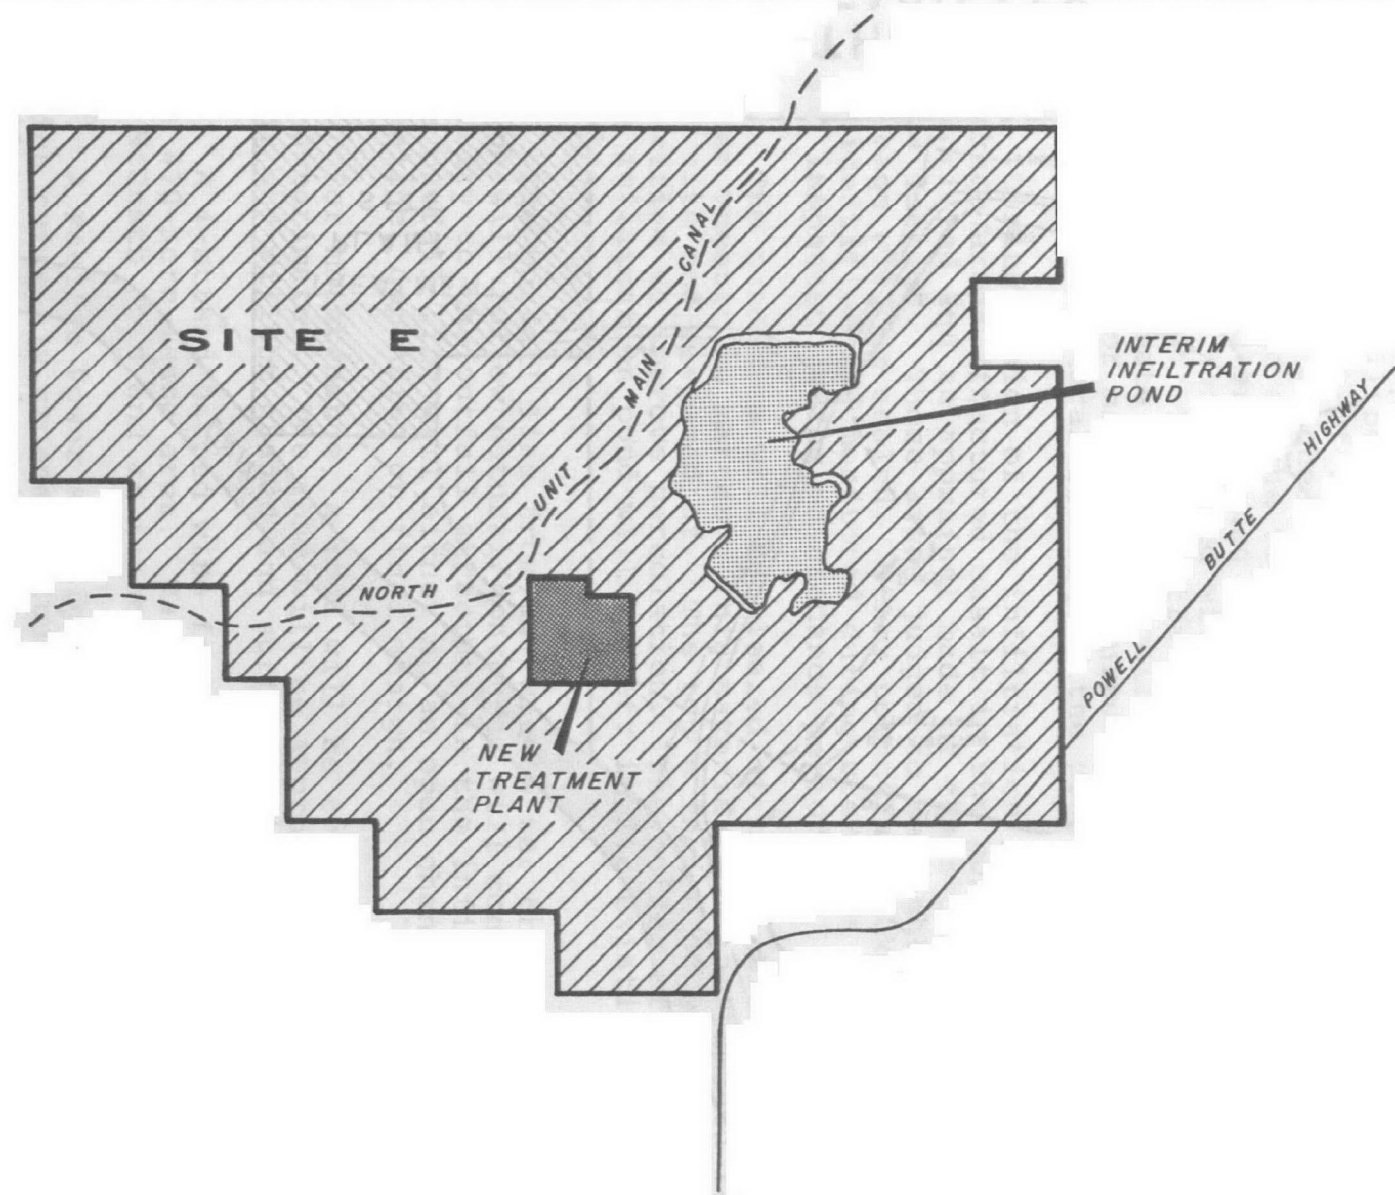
LOCATION OF INTERIM INFILTRATION POND - SITE E
